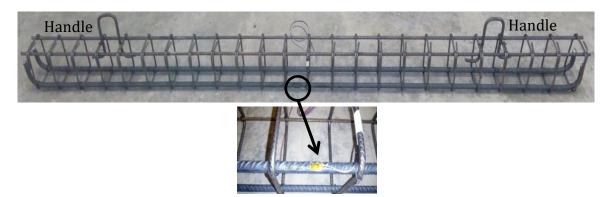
Steel reinforcement cage and instrumentation of tension steel strain gage.
